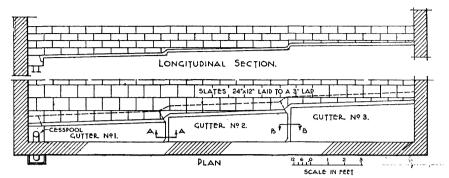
LEAD GUTTER TO PARAPET WALL
